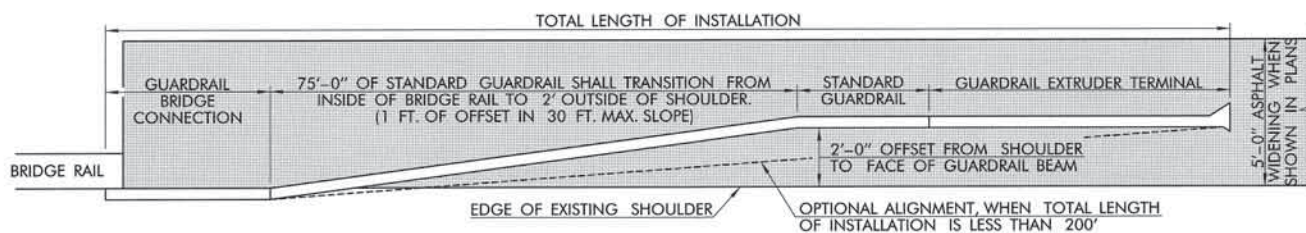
DETAIL OF SHOULDER WIDENING FOR STANDARD GUARDRAIL
